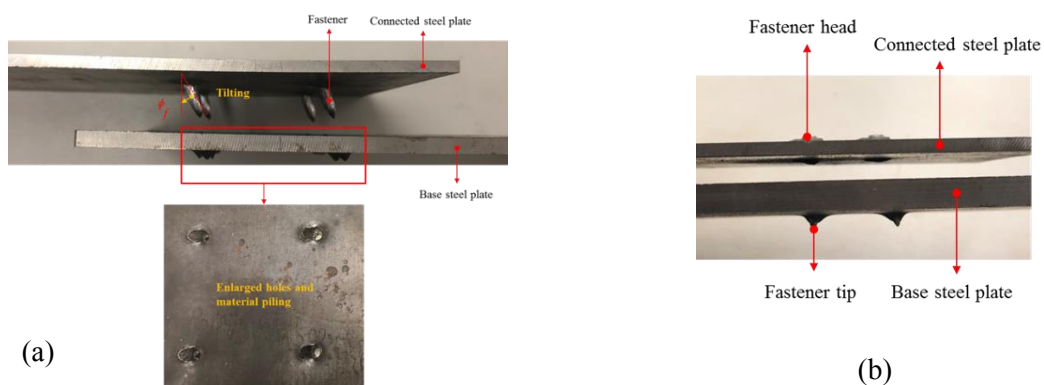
Failure modes: (a) bearing failure (b) shear fracture of fastener
